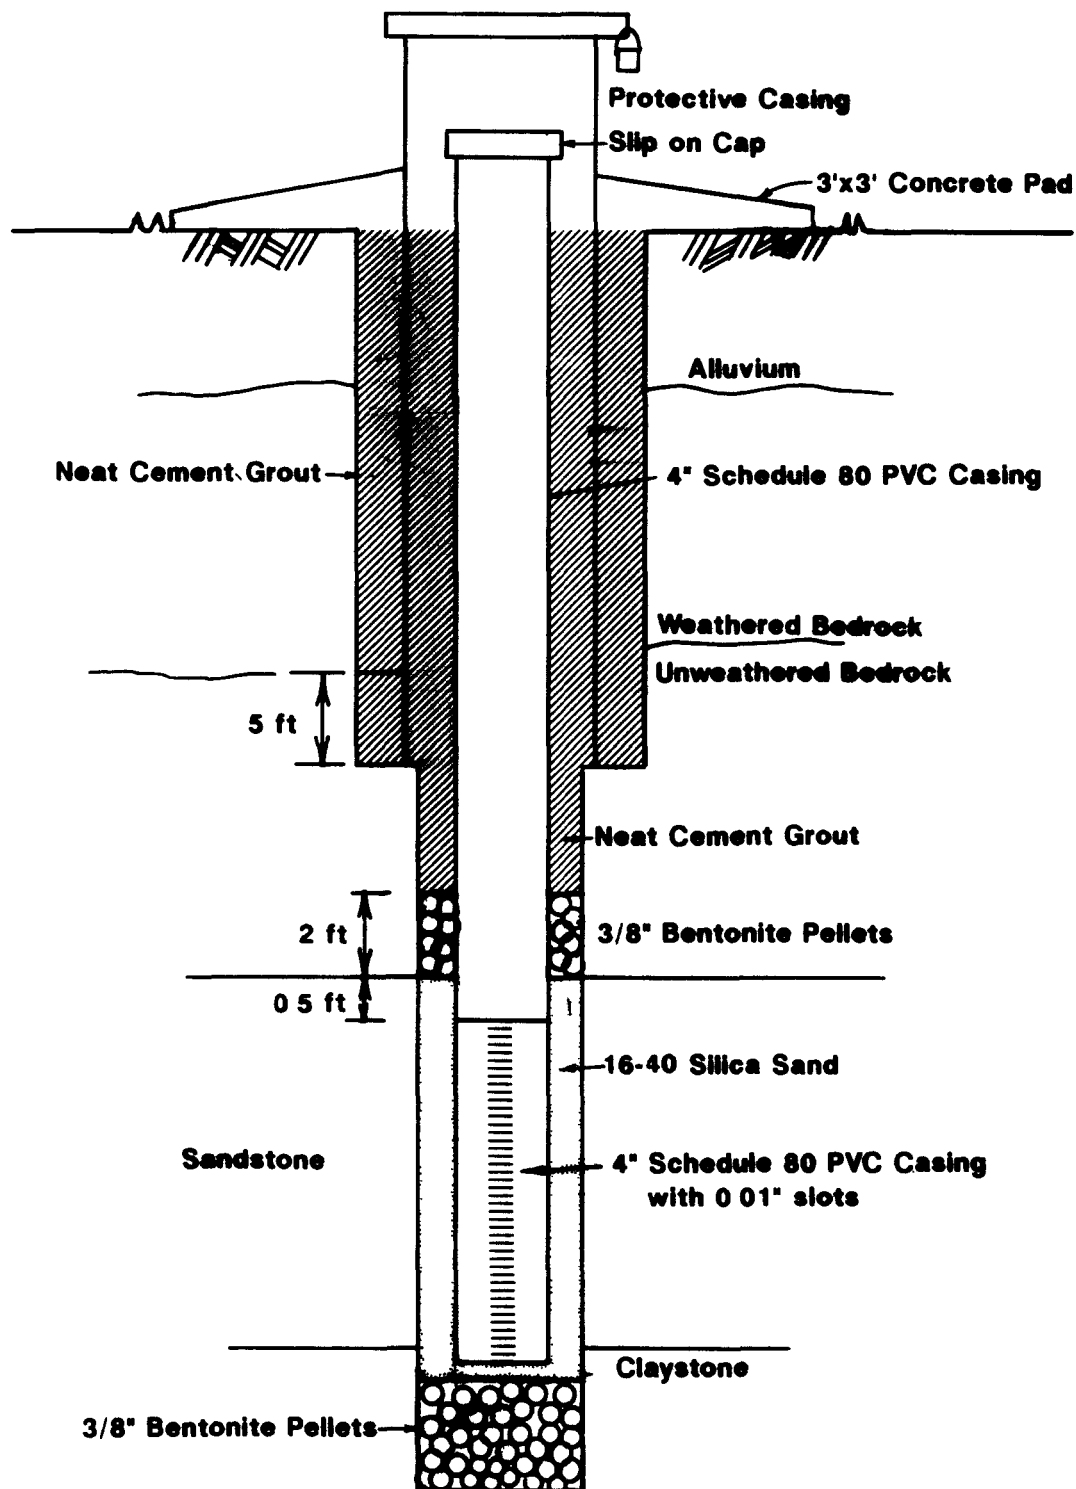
DEEP BEDROCK MONITOR WELL CONSTRUCTION
